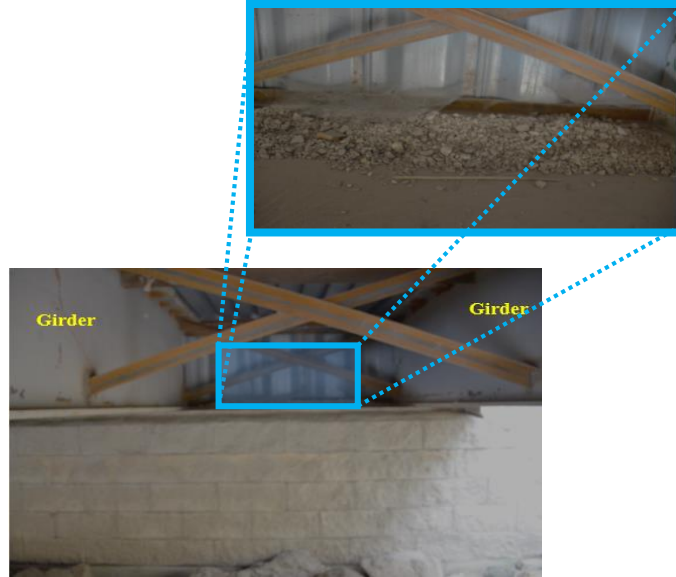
No geotextile layer was used on the top of abutment before placing the beam seat
